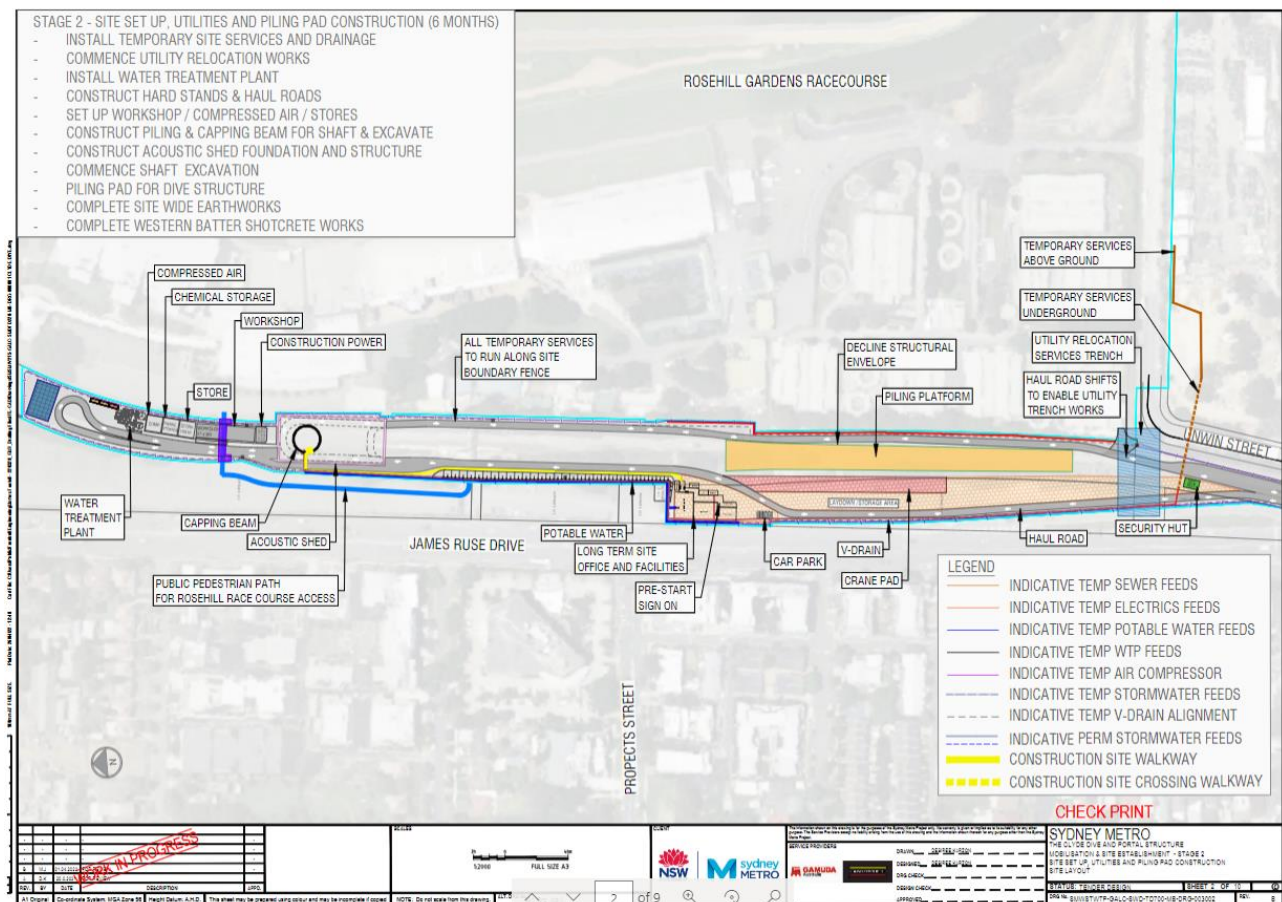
Clyde Dive and Portal Structure Construction Site
